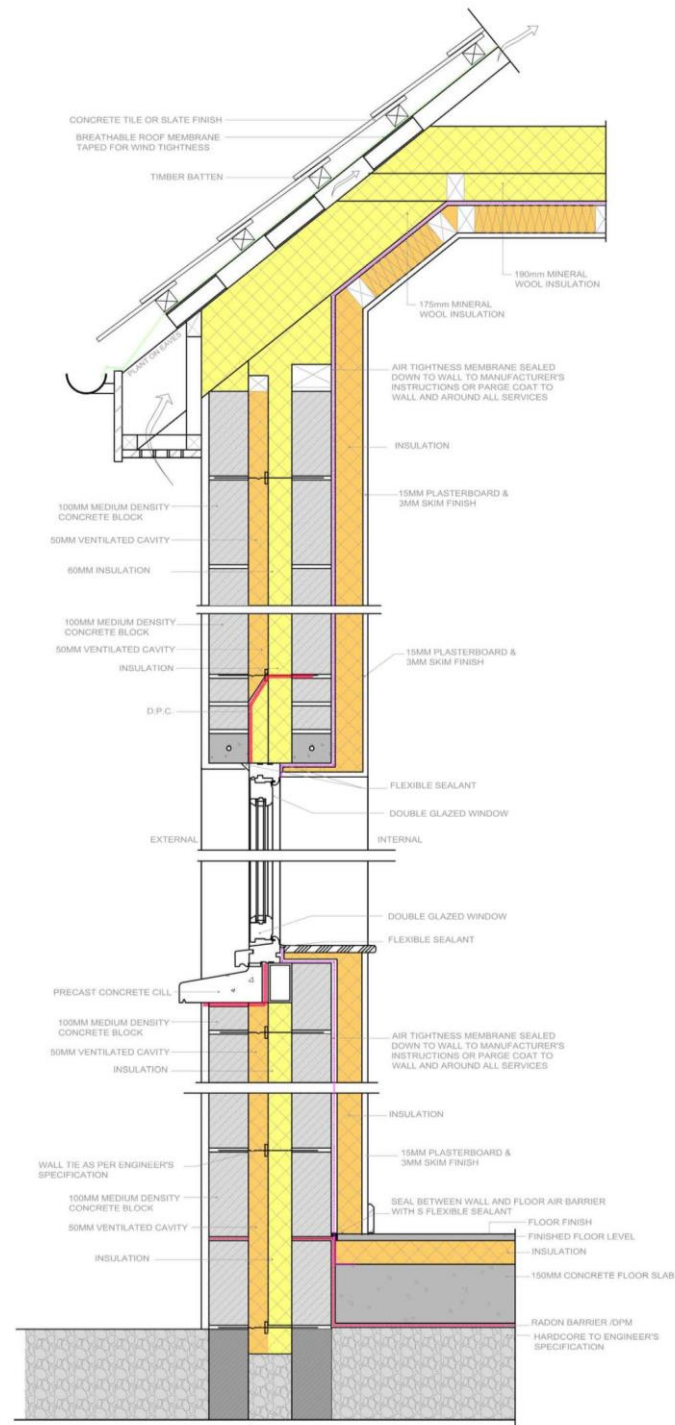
Typical approach used in Ireland to upgrade a cavity wall construction
